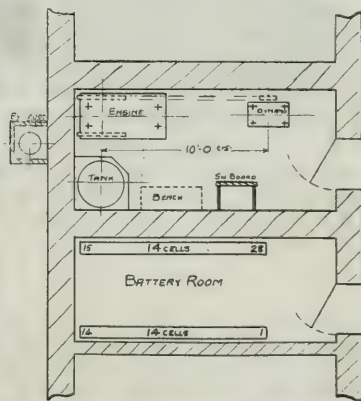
ELECTRICAL PLANT INSTALLED IN AN EXISTING BUILDING.
